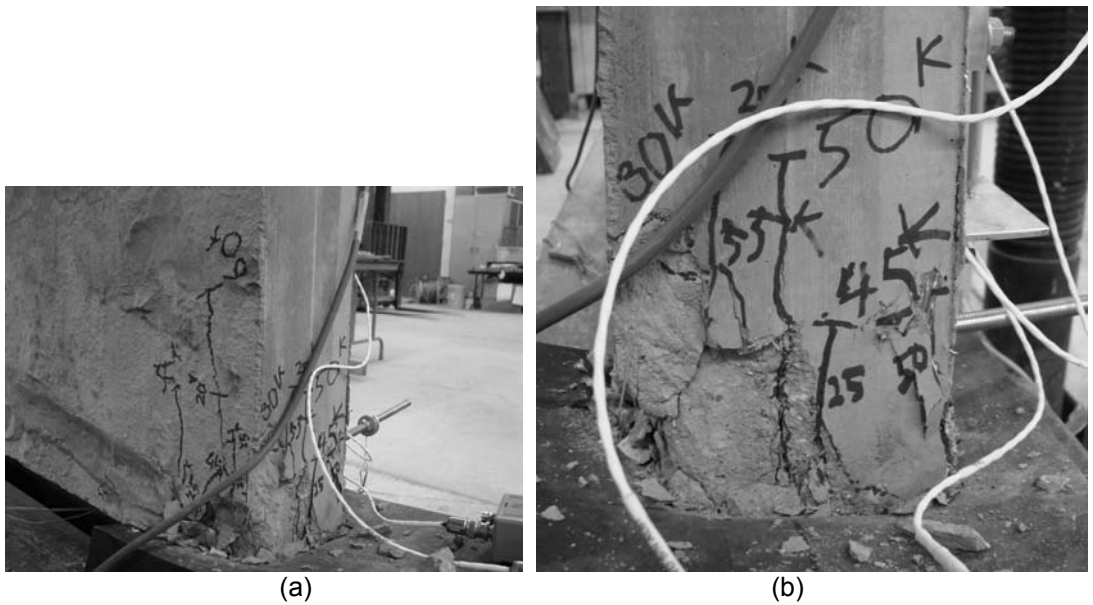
Right support of SFRC specimen at 60 kip – oblique view (a) and end view (b)
